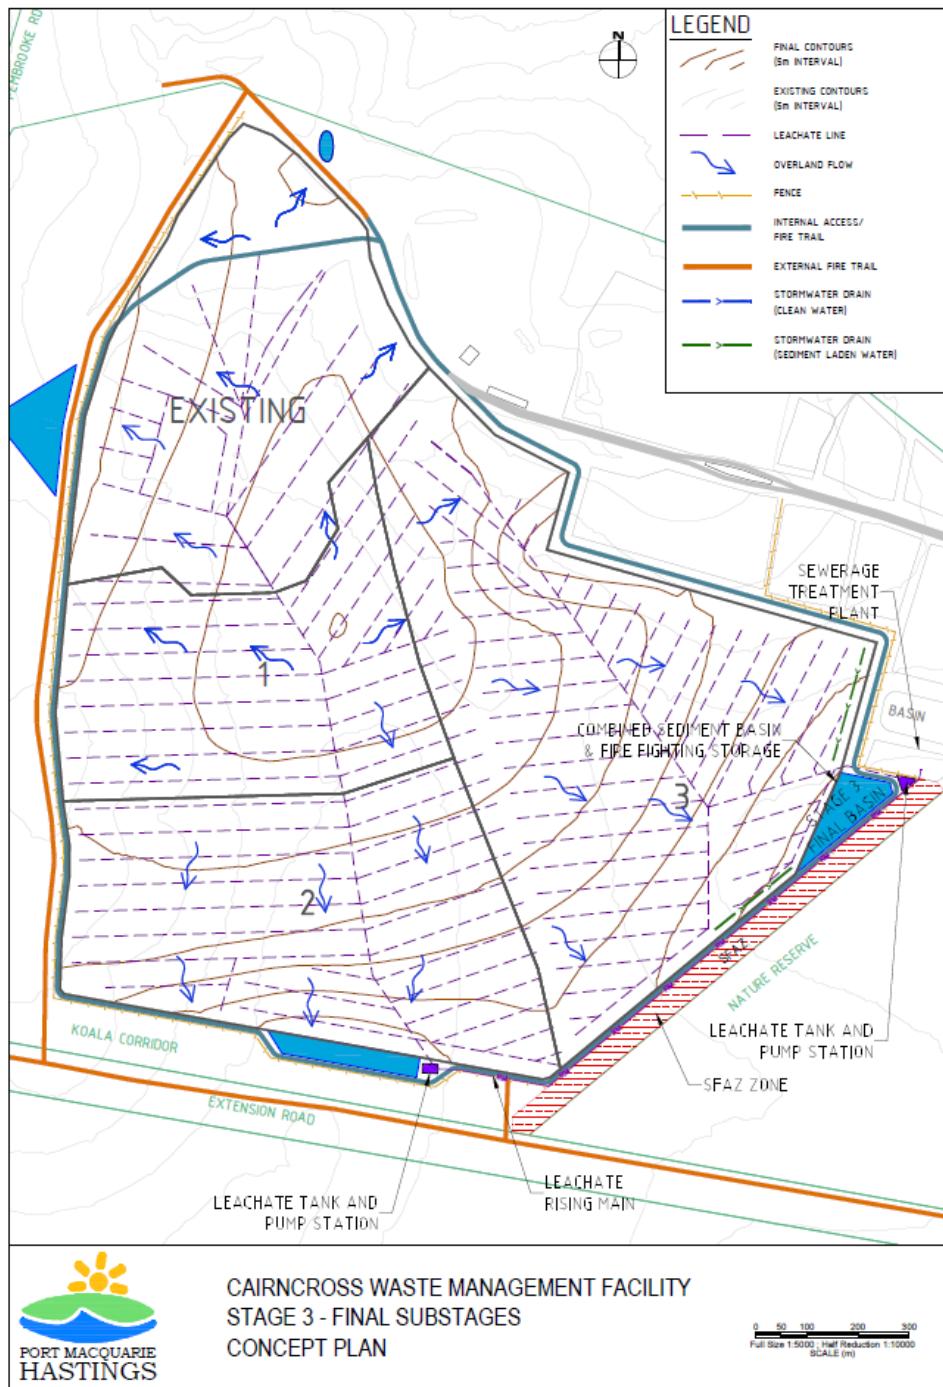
Amended Proposal layout Stage 3 (Final Sub Stages)
